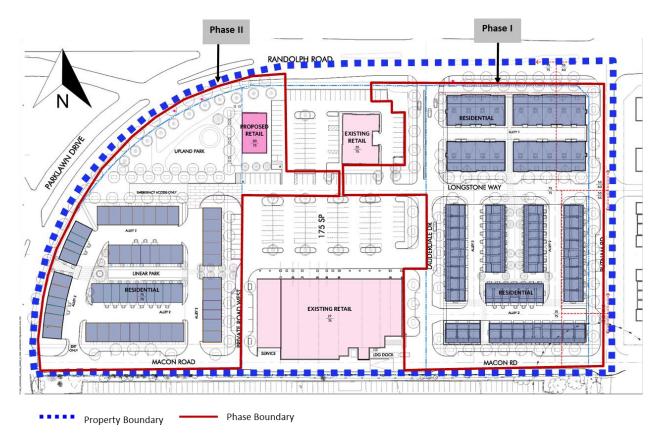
Proposed Sketch Plan – Interim Buildout with Phases I & II
